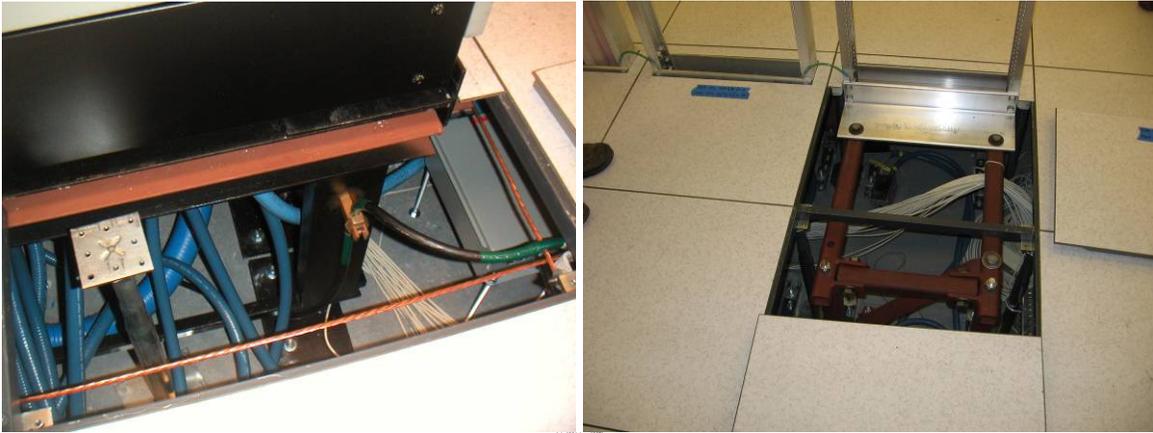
Steel frames used for some equipment in CPU rooms 1 and 2
